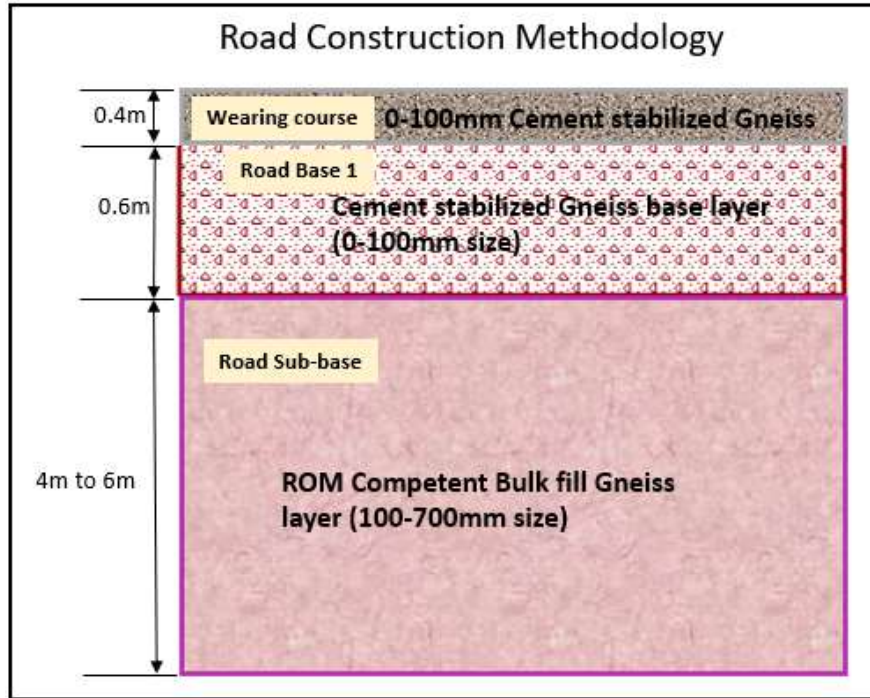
Cement stabilised haul road typical section (Barrick Lumwana Mine, 2020)
